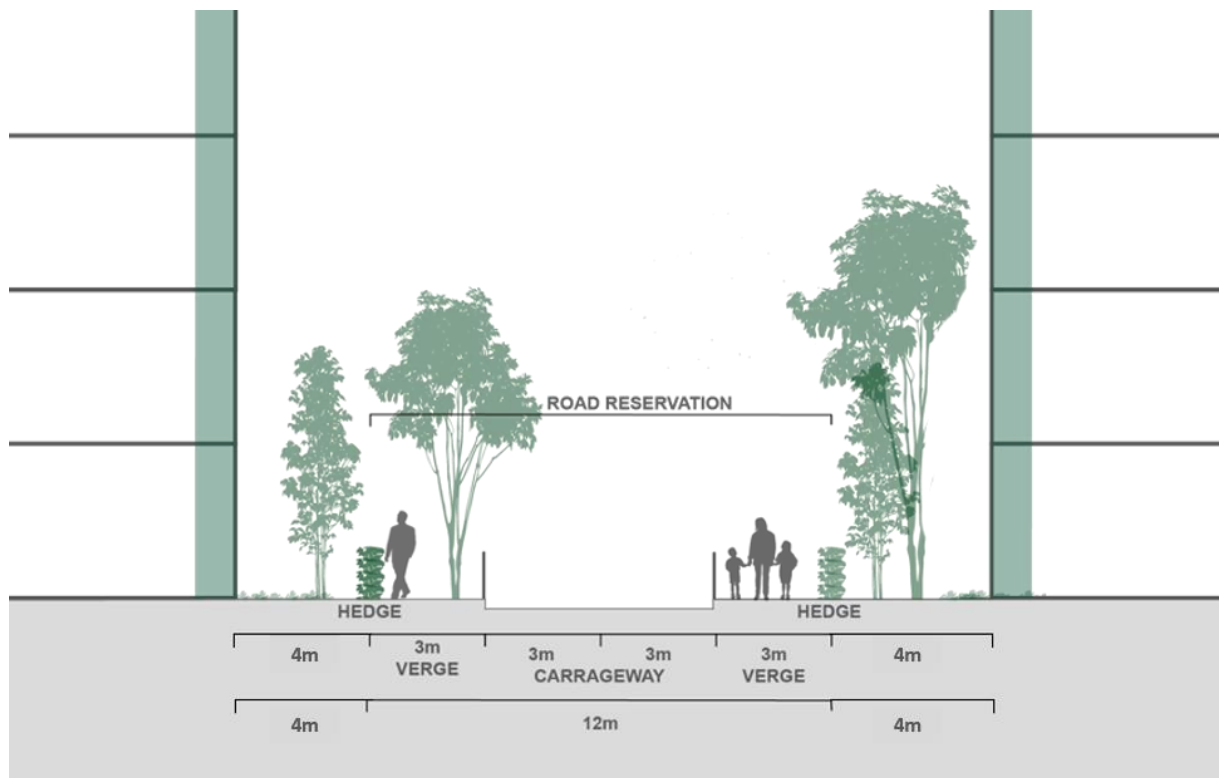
(a): Section - New Road (between Berry – Park Road)
